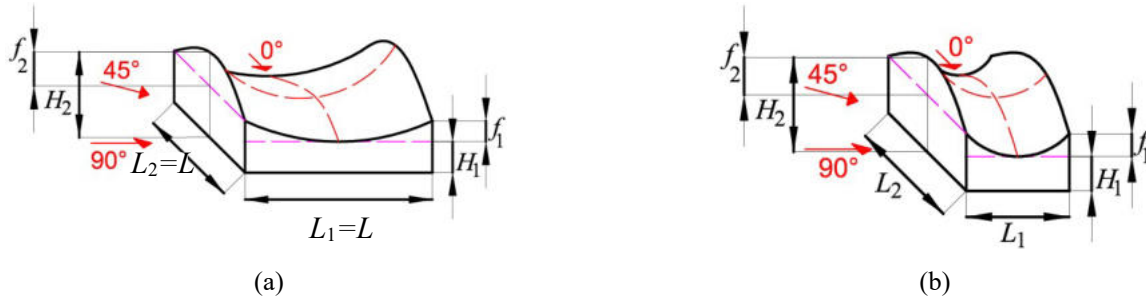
Building geometrical parameters and wind angles of attack during experiments: (a) square plan and (b) rectangular plan building.
